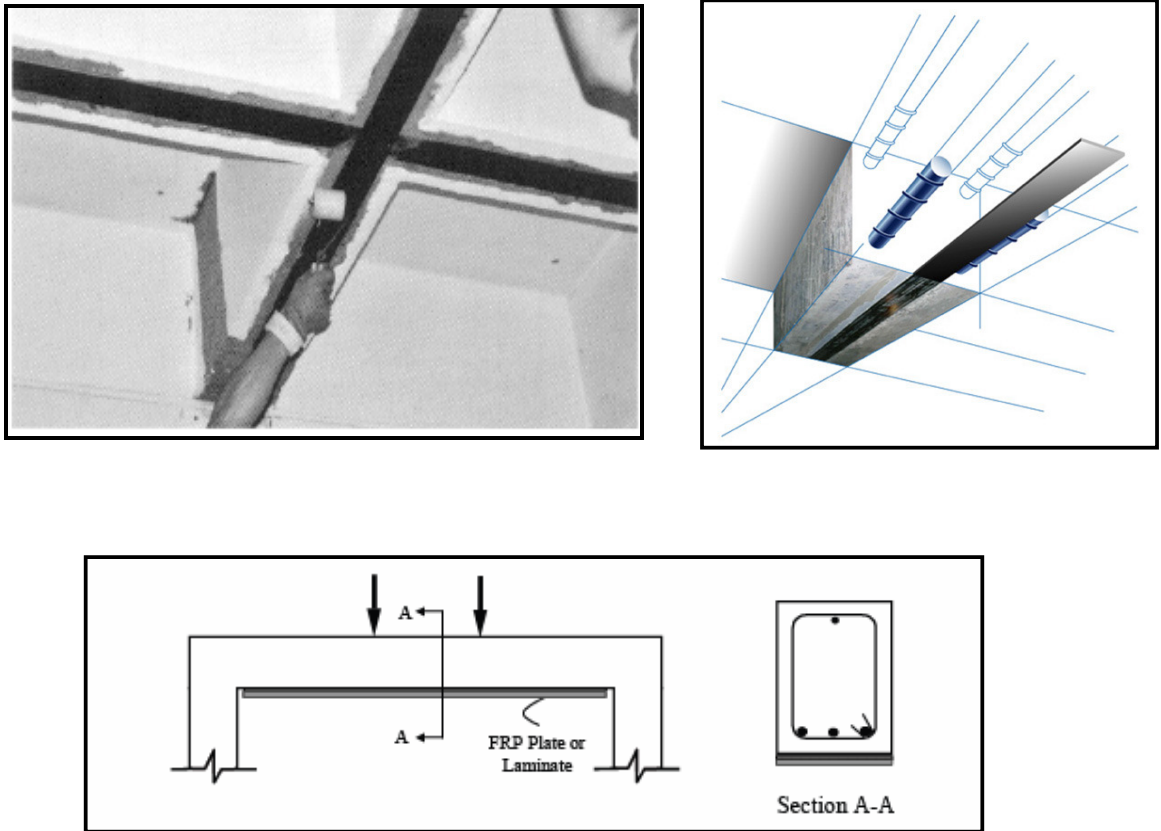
Flexural strengthening of RC beams with CFRP
